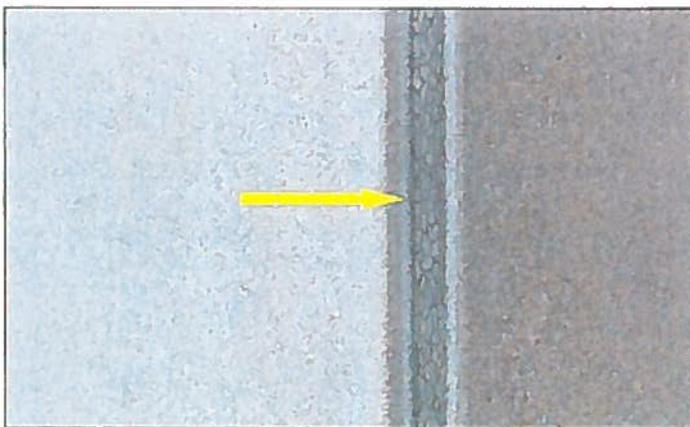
Deteriorated building sealant joint (typical all elevations).
